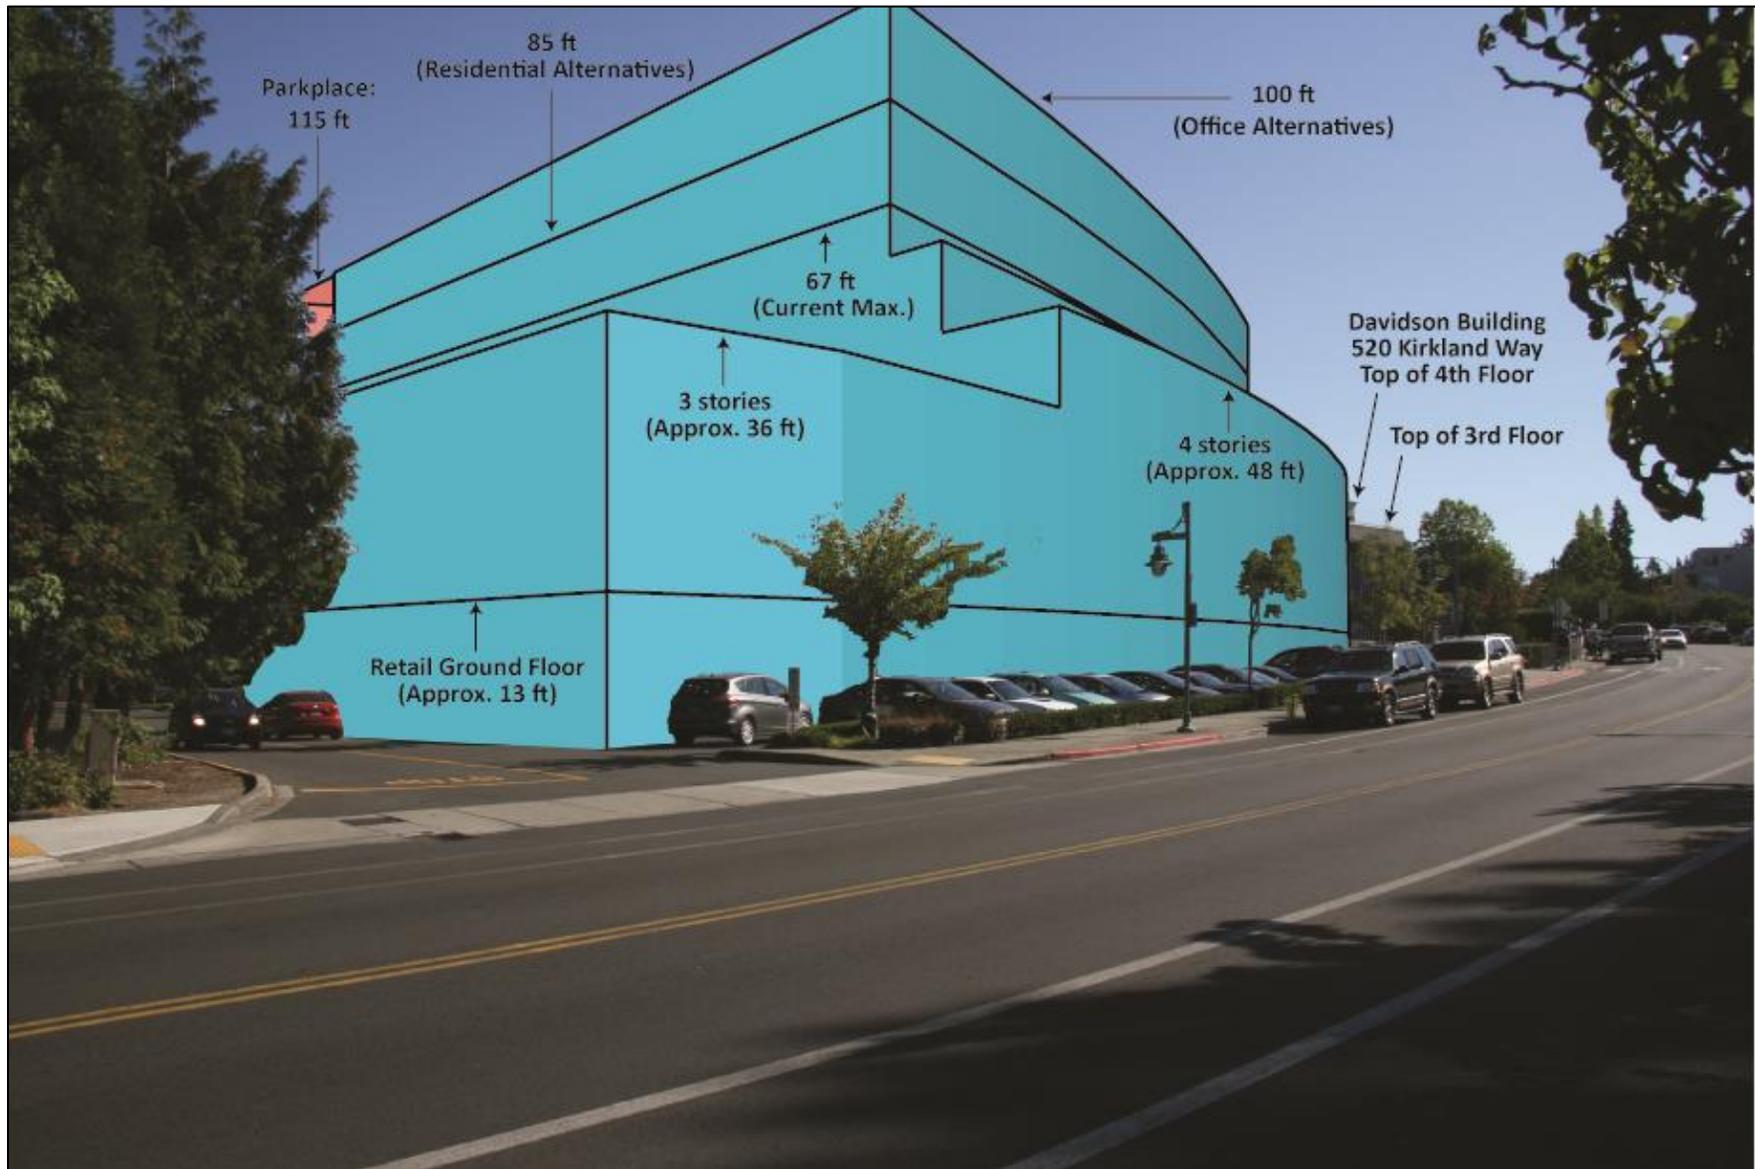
Viewpoint 2 – MRM Site Alternatives
